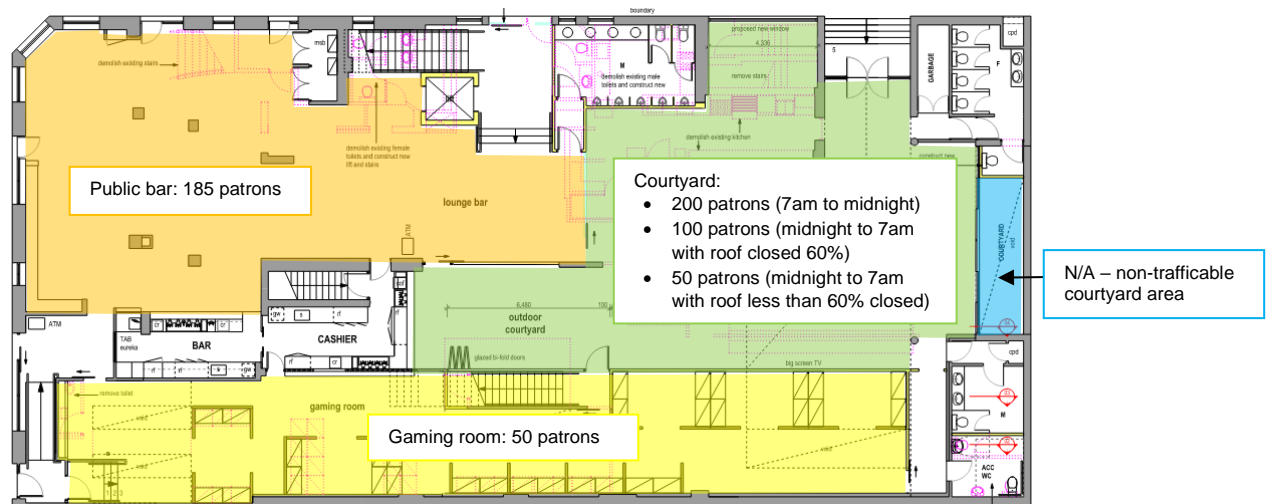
Markup of proposed ground floor plan – maximum patron capacity
